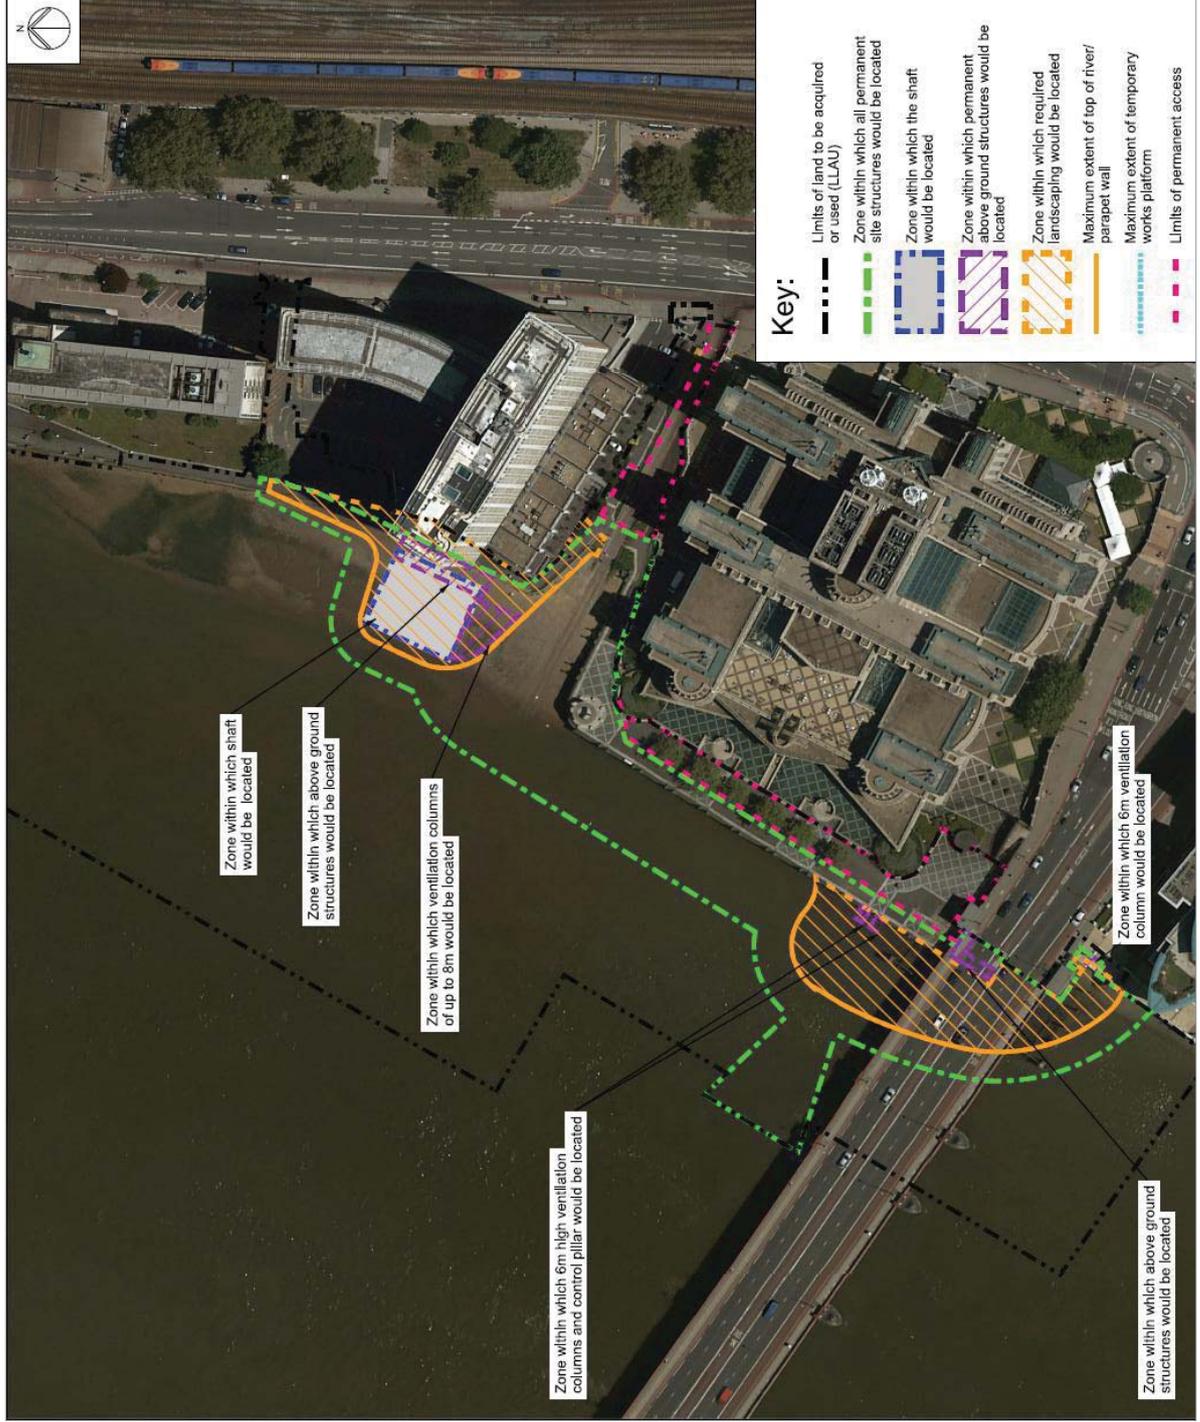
Schematic layout at the Albert Embankment Foreshore site
